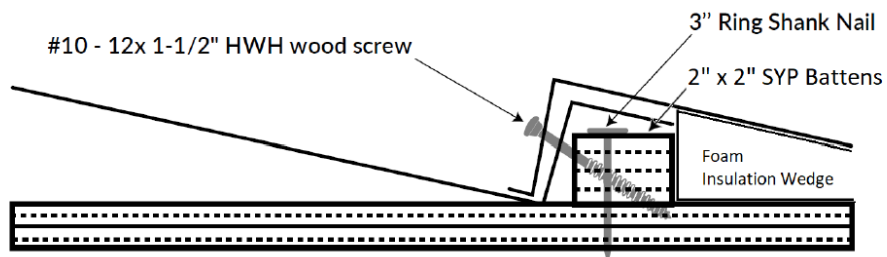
ATTACHMENT METHOD 3 – HURRICANE METAL SHAKE
